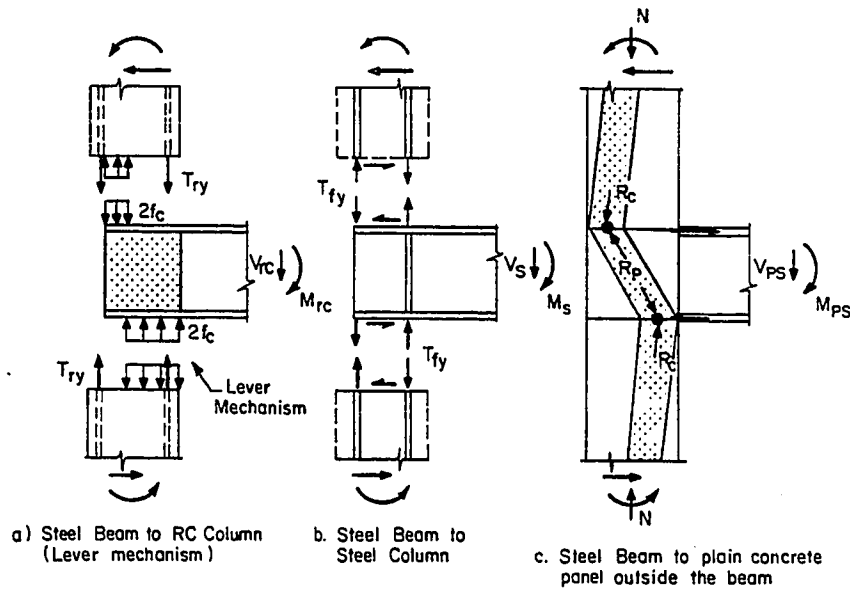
Stress transferring mechanism in exterior joint (Ref. 34).
